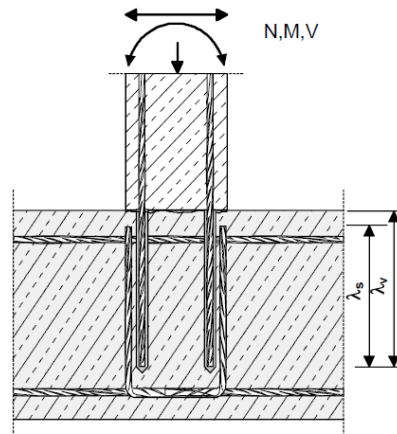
Overlap joint at a foundation of a column or wall where the rebars are stressed in tension
